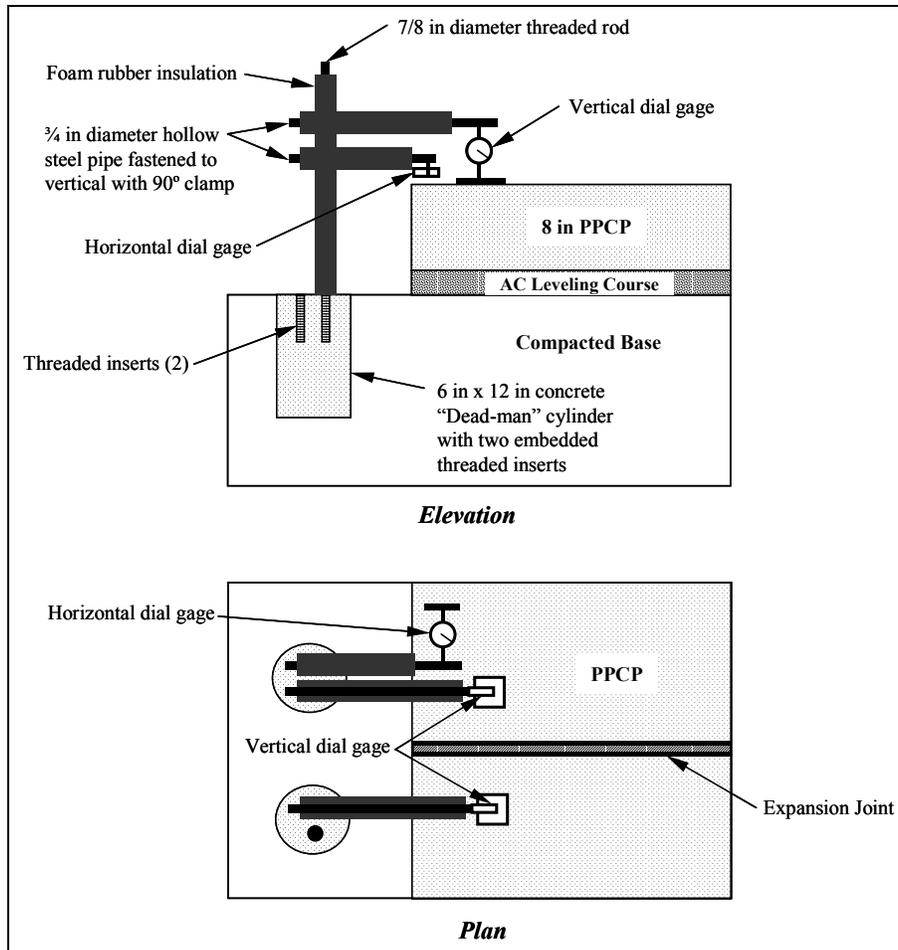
Locations for the i-Buttons<sup>®</sup>, curling instrumentation, and horizontal movement measurements for the Georgetown precast pavement
